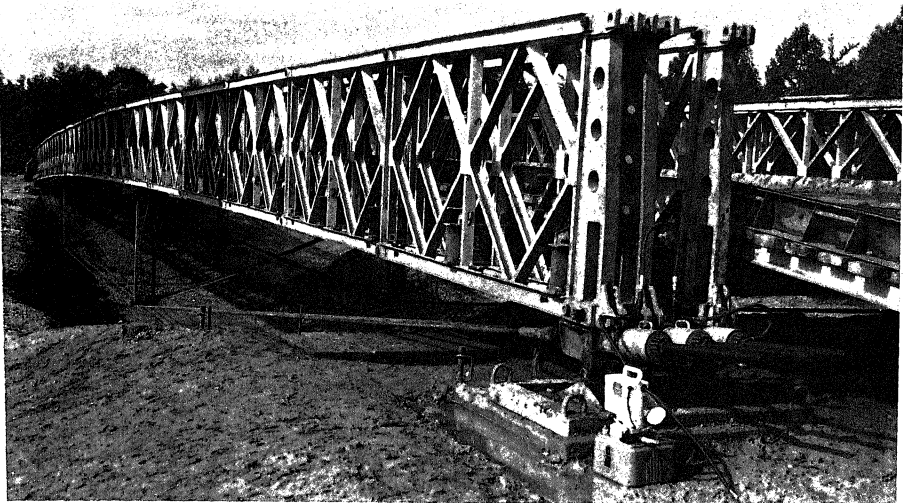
Span junction posts replacing standard end post on Bailey bridge with cable reinforcement set.
